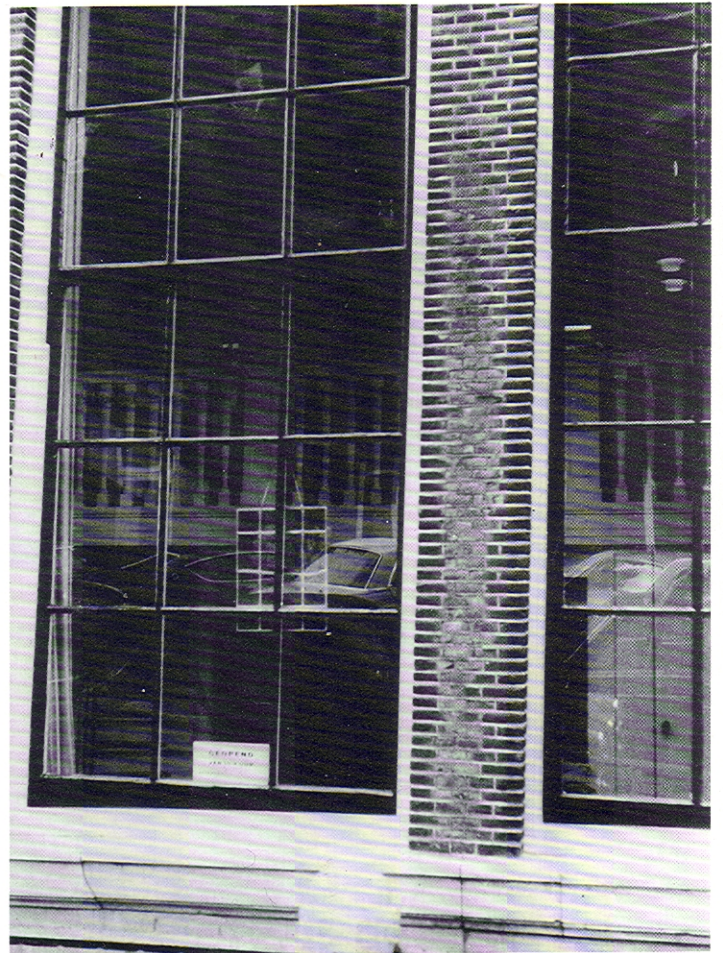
The mezzanine floor as a traditional element in the canal house allowing for tall ground floor windows.
